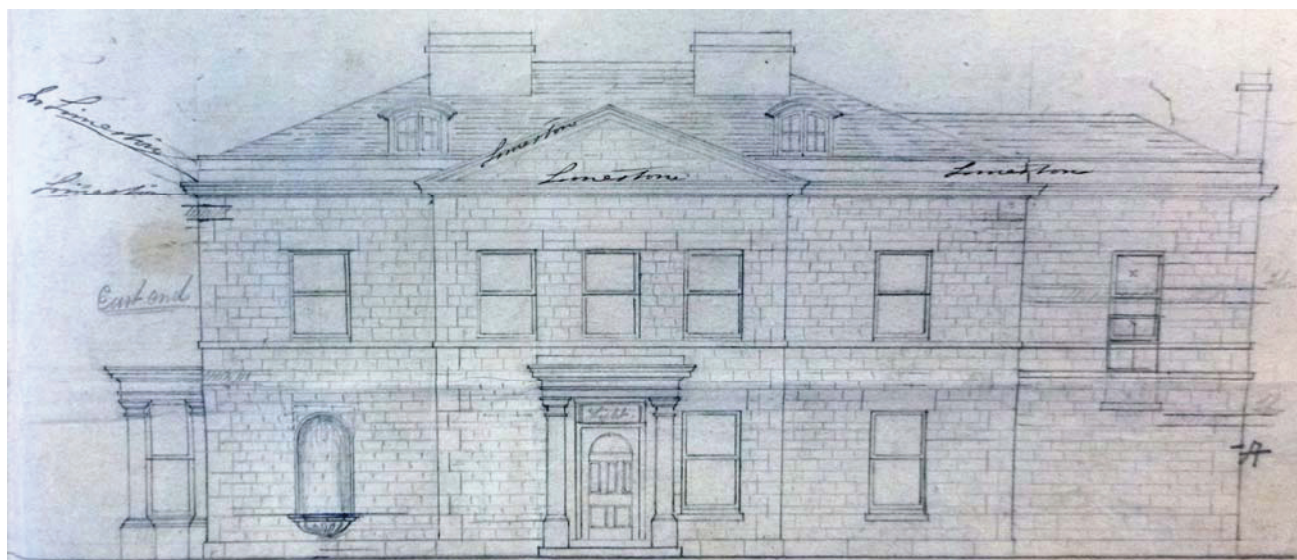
The north elevation of Fair View – marked 'north elevation No 2', either the second or the only option for proposed alterations, 1889
